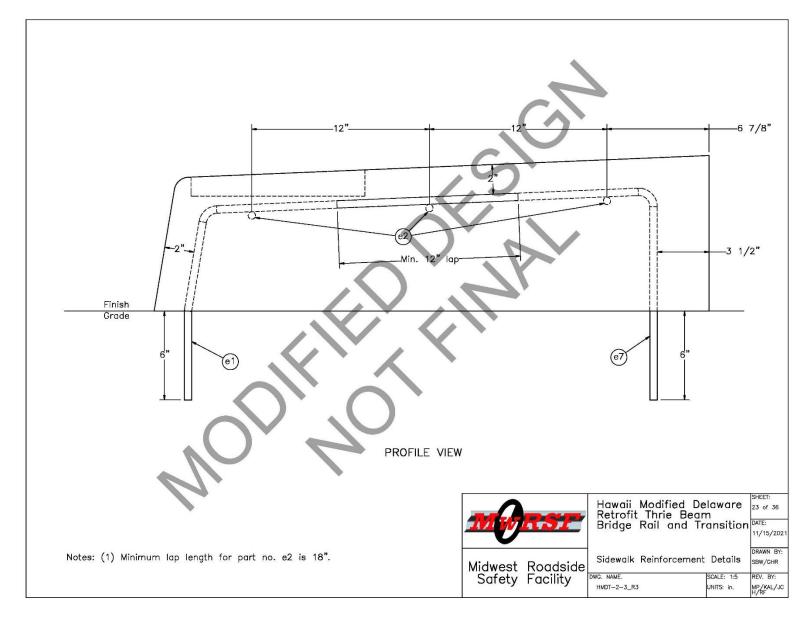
Sidewalk Reinforcement Details, Test Nos. HMDT-2 and HMDT-3
